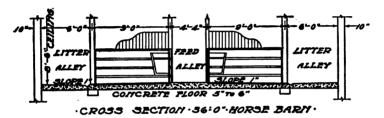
A cross-section of a 36-foot horse barn—horses faced in.
